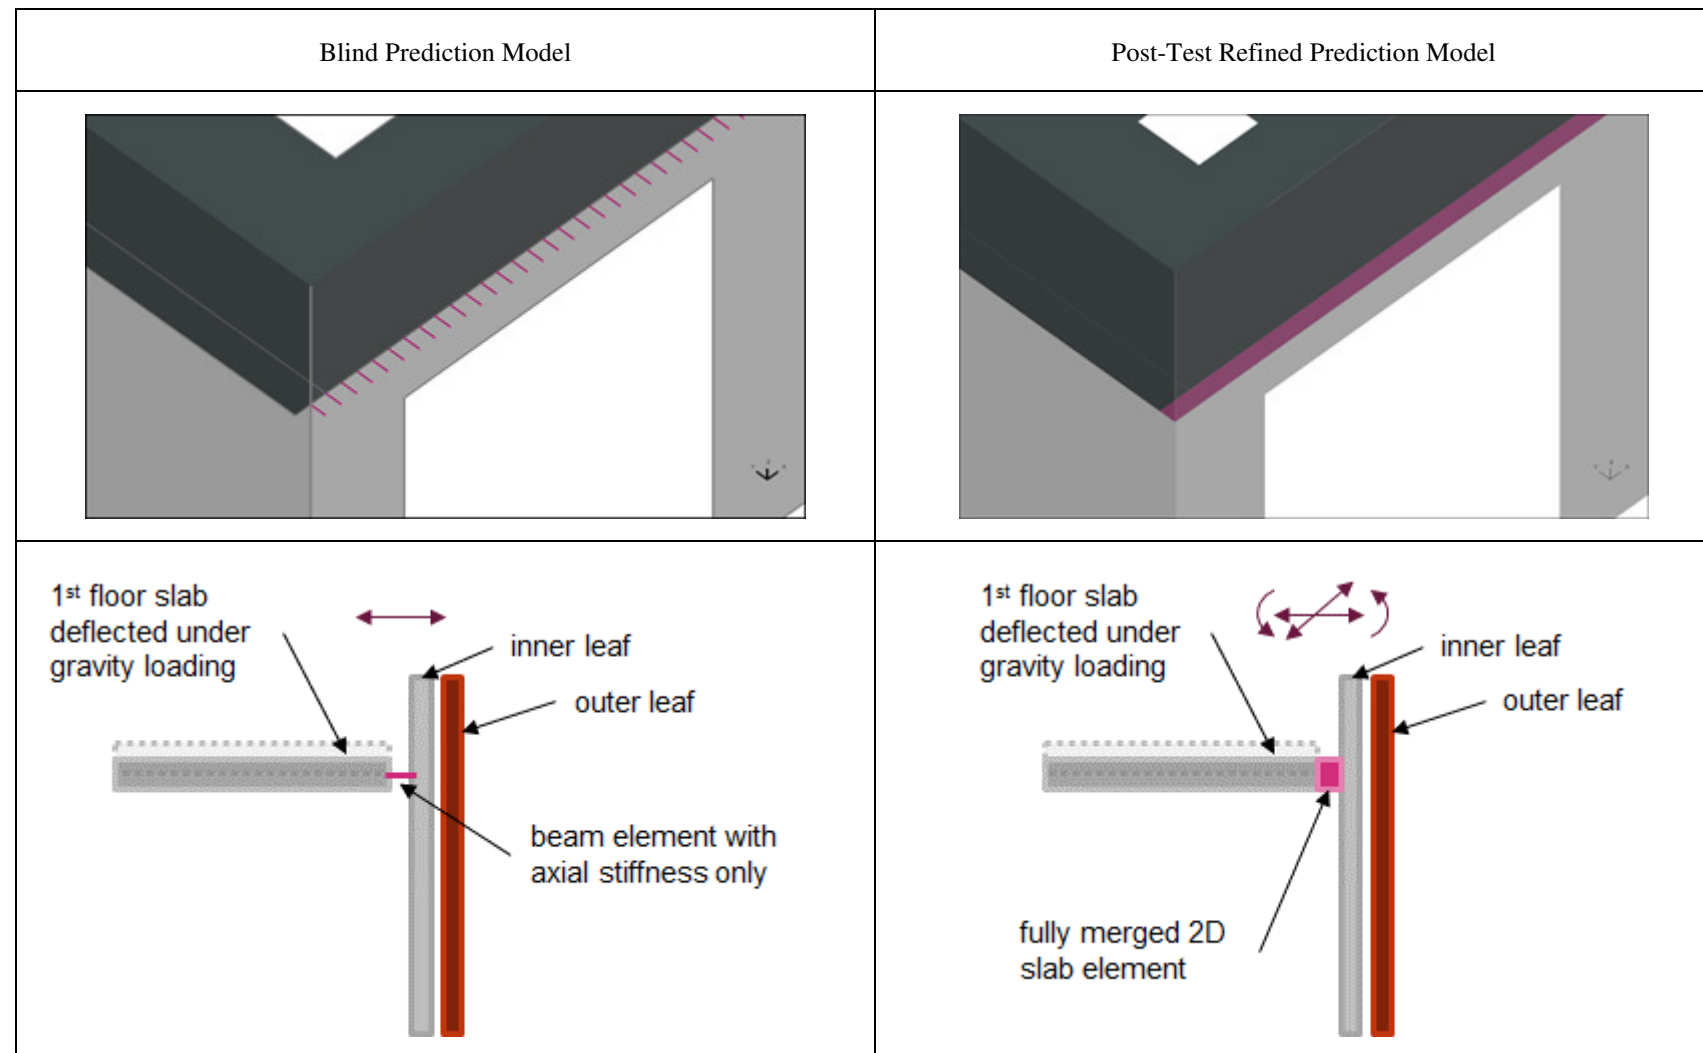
Change in connection between first floor slab and East/West walls in LS-DYNA post-test refined model
